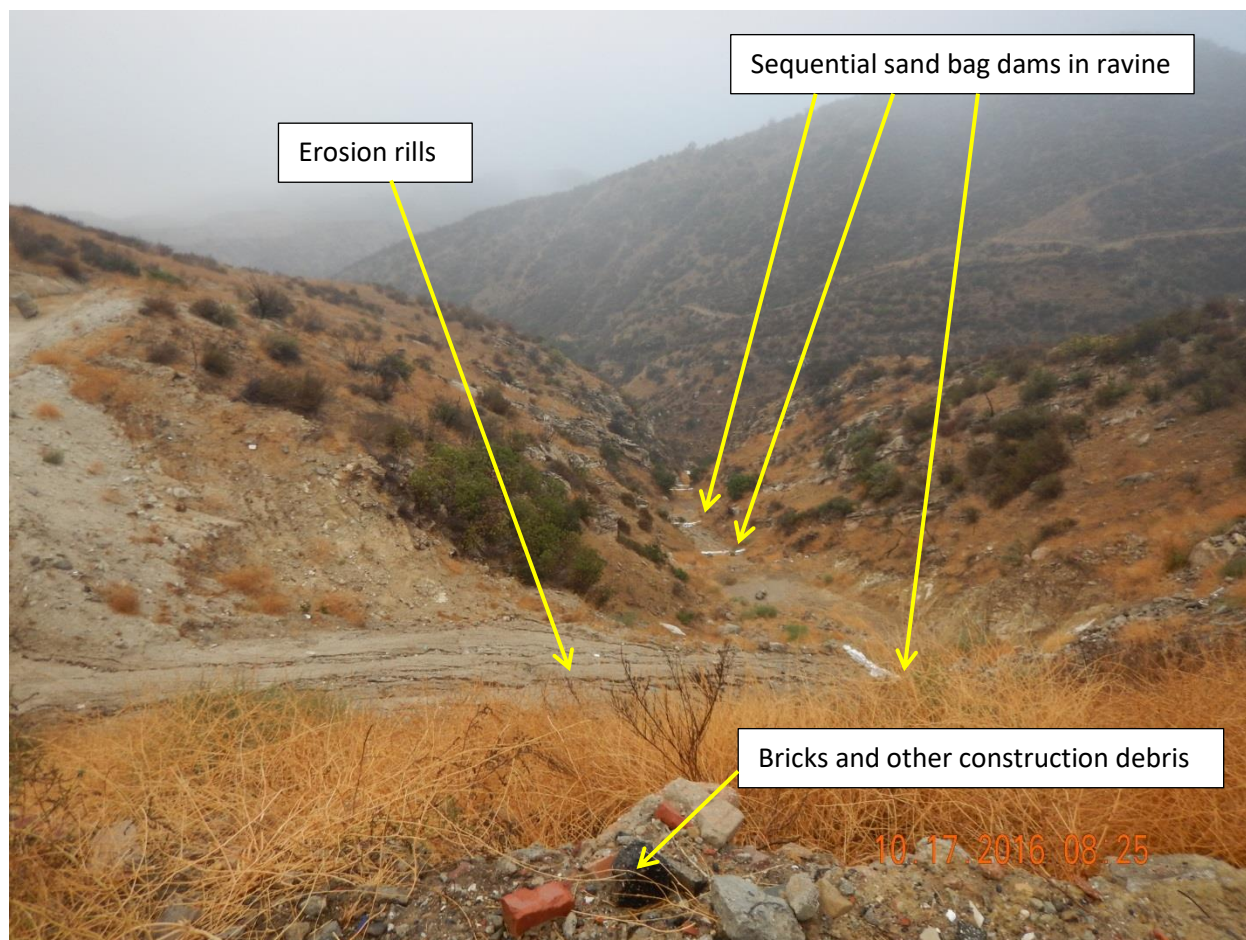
This photo shows construction debris piles found in the northeast section of Parcel 2821-002-023, near latitude: 34 18.622 and longitude: -118 36.766.
